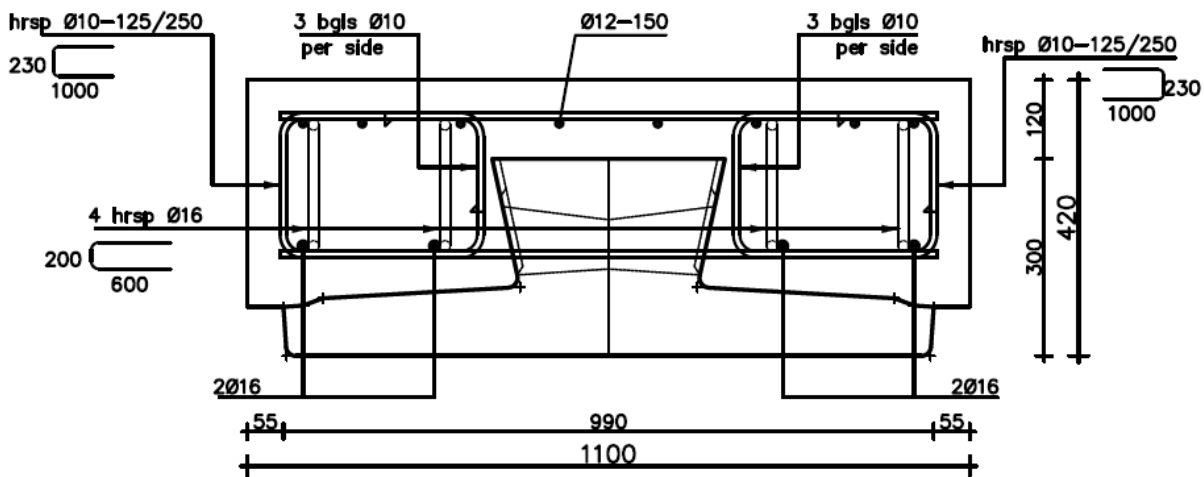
Reinforcement setup in the topping of the composite girder in a cross section at 925 mm from the edge.
